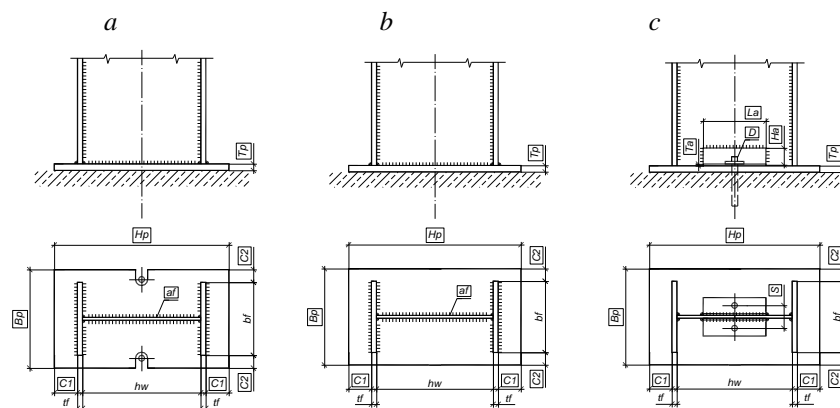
Types of designs for nominally pinned column bases without wing plates and cantilever stiffeners
